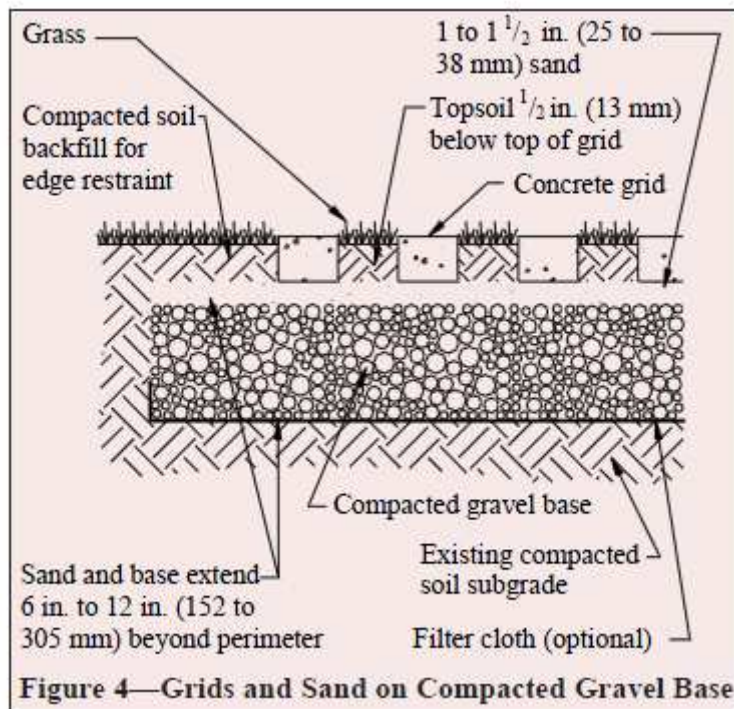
Concrete grid section (National Concrete Masonry Association, 2001)
